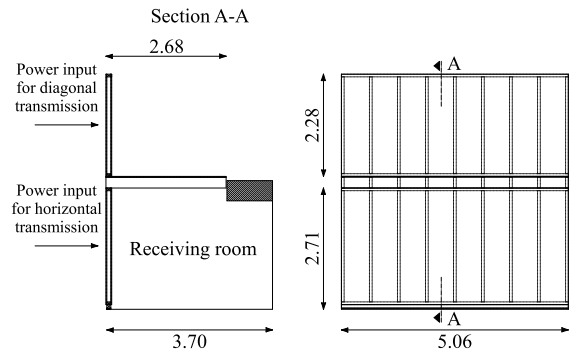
Laboratory test construction: Sketch of cross-section through T-junction (dimensions in metres).
